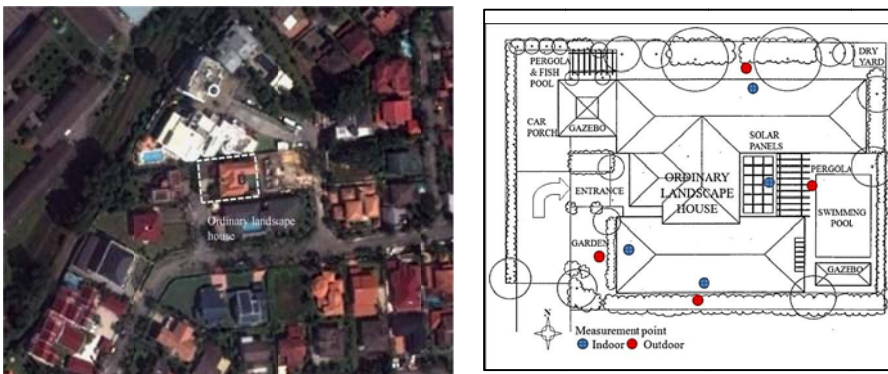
Location plan (left) and landscape plan (right) of the ordinary landscape house
